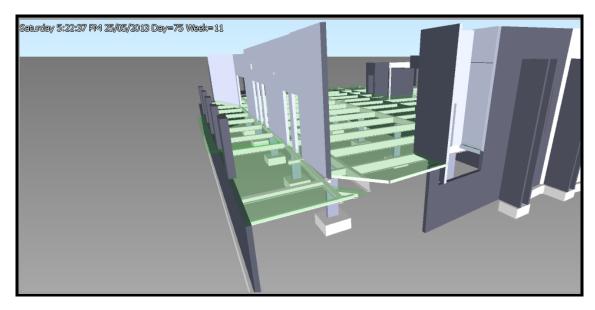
Building Approval Stage (Viewpoint 1) - Works Complete Week 11
